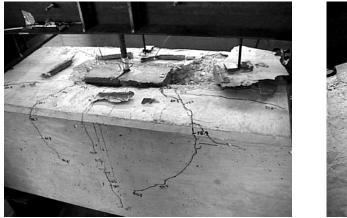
Grout Pocket at Failure for MF928 and EHF (SL11 and SL12)
